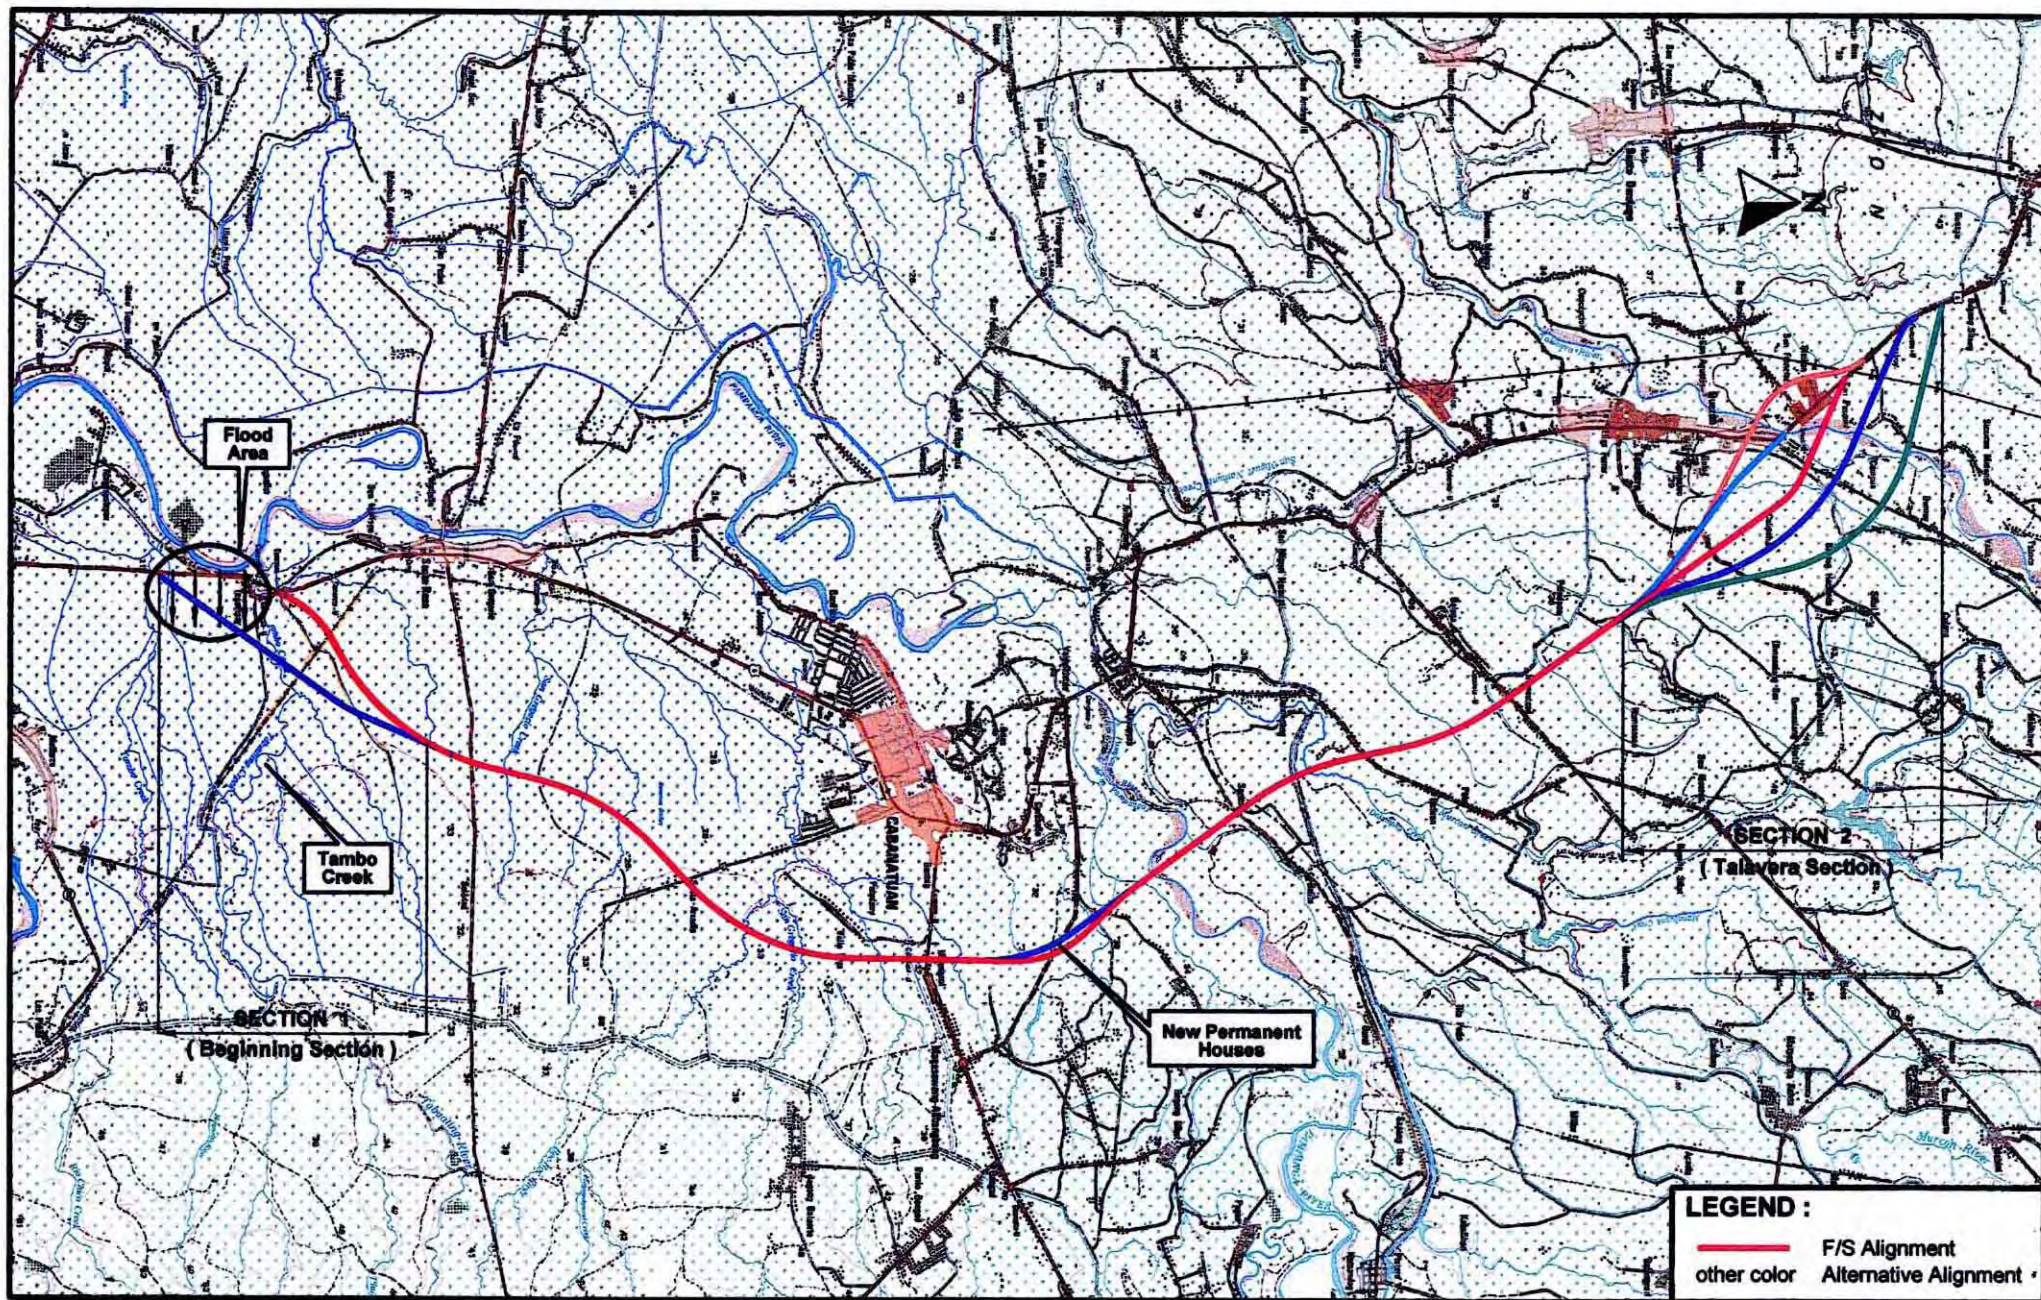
ALTERNATIVE ALIGNMENTS FOR CABANATUAN BYPASS
